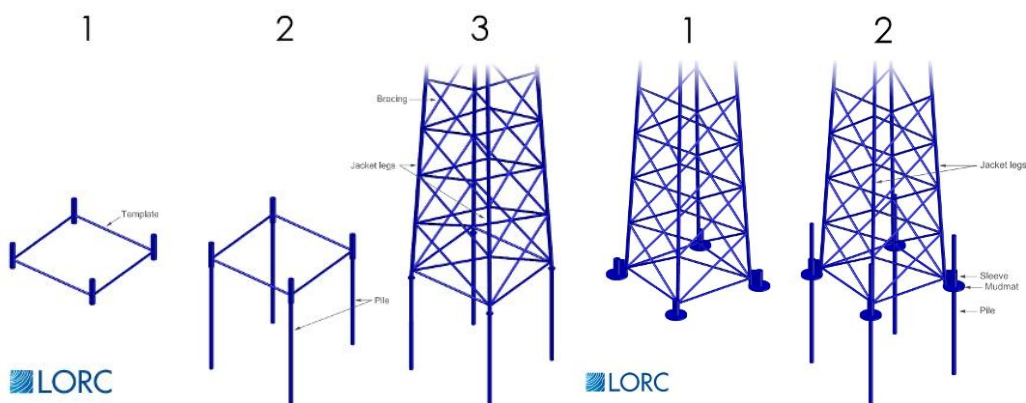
Pre - piling and Post - piling of the jackets foundation
